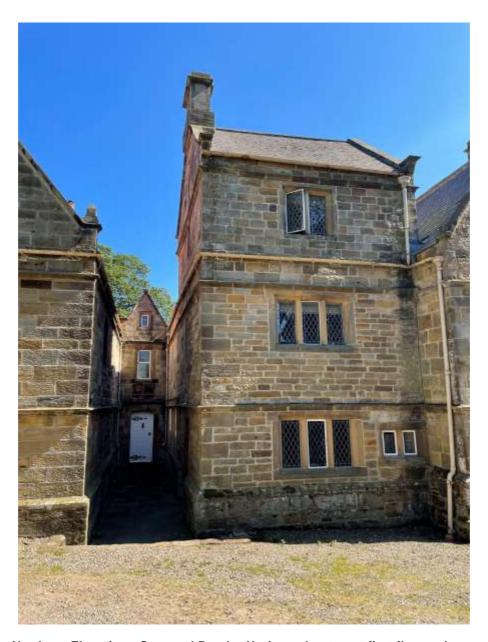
Northwst Elevation - Storeyed Porch - Horizontal gutter at first floor to be removed. Downpipe and gutter to roof to be renewed. Downpipe to side of 'Orginial House' to be renewed with new box hopper at top to fix the existing water ingress problems. Please also take note of the roof covering to the storeyed porch. It is proposed this roof is replaced on a like for like basis.
